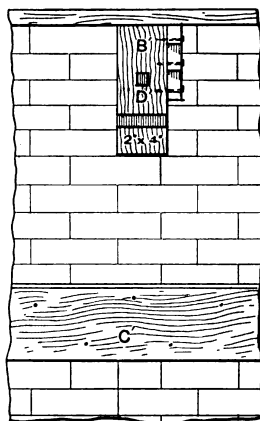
Front Elevation of Wooden Lookout Secured to Wall.
